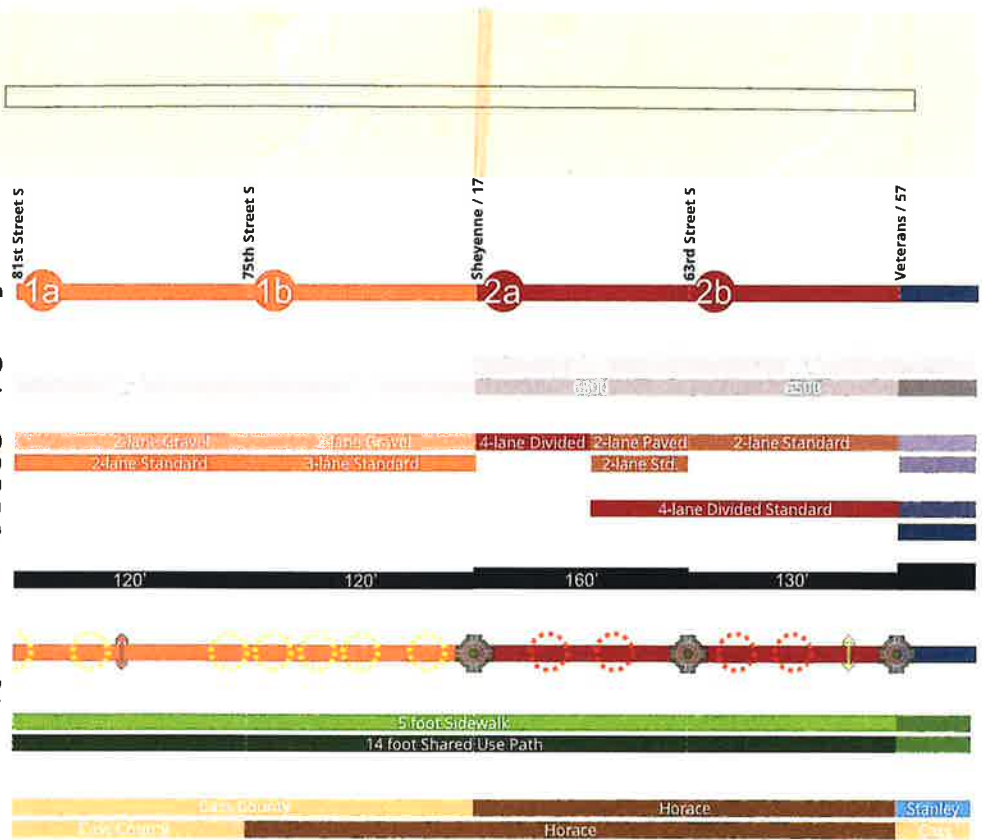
Phasing Plan for Alternative 1 - Segment 3
